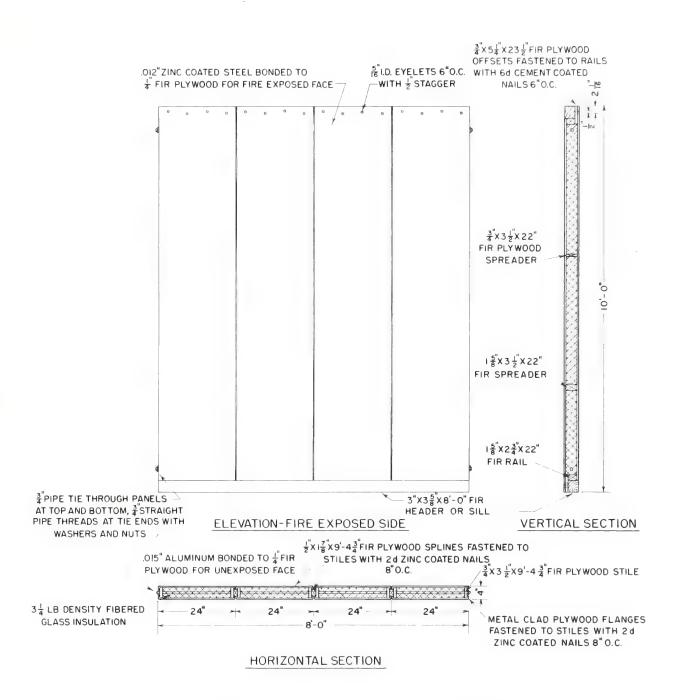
CONSTRUCTION DETAILS OF TEST PANEL NO. 4
